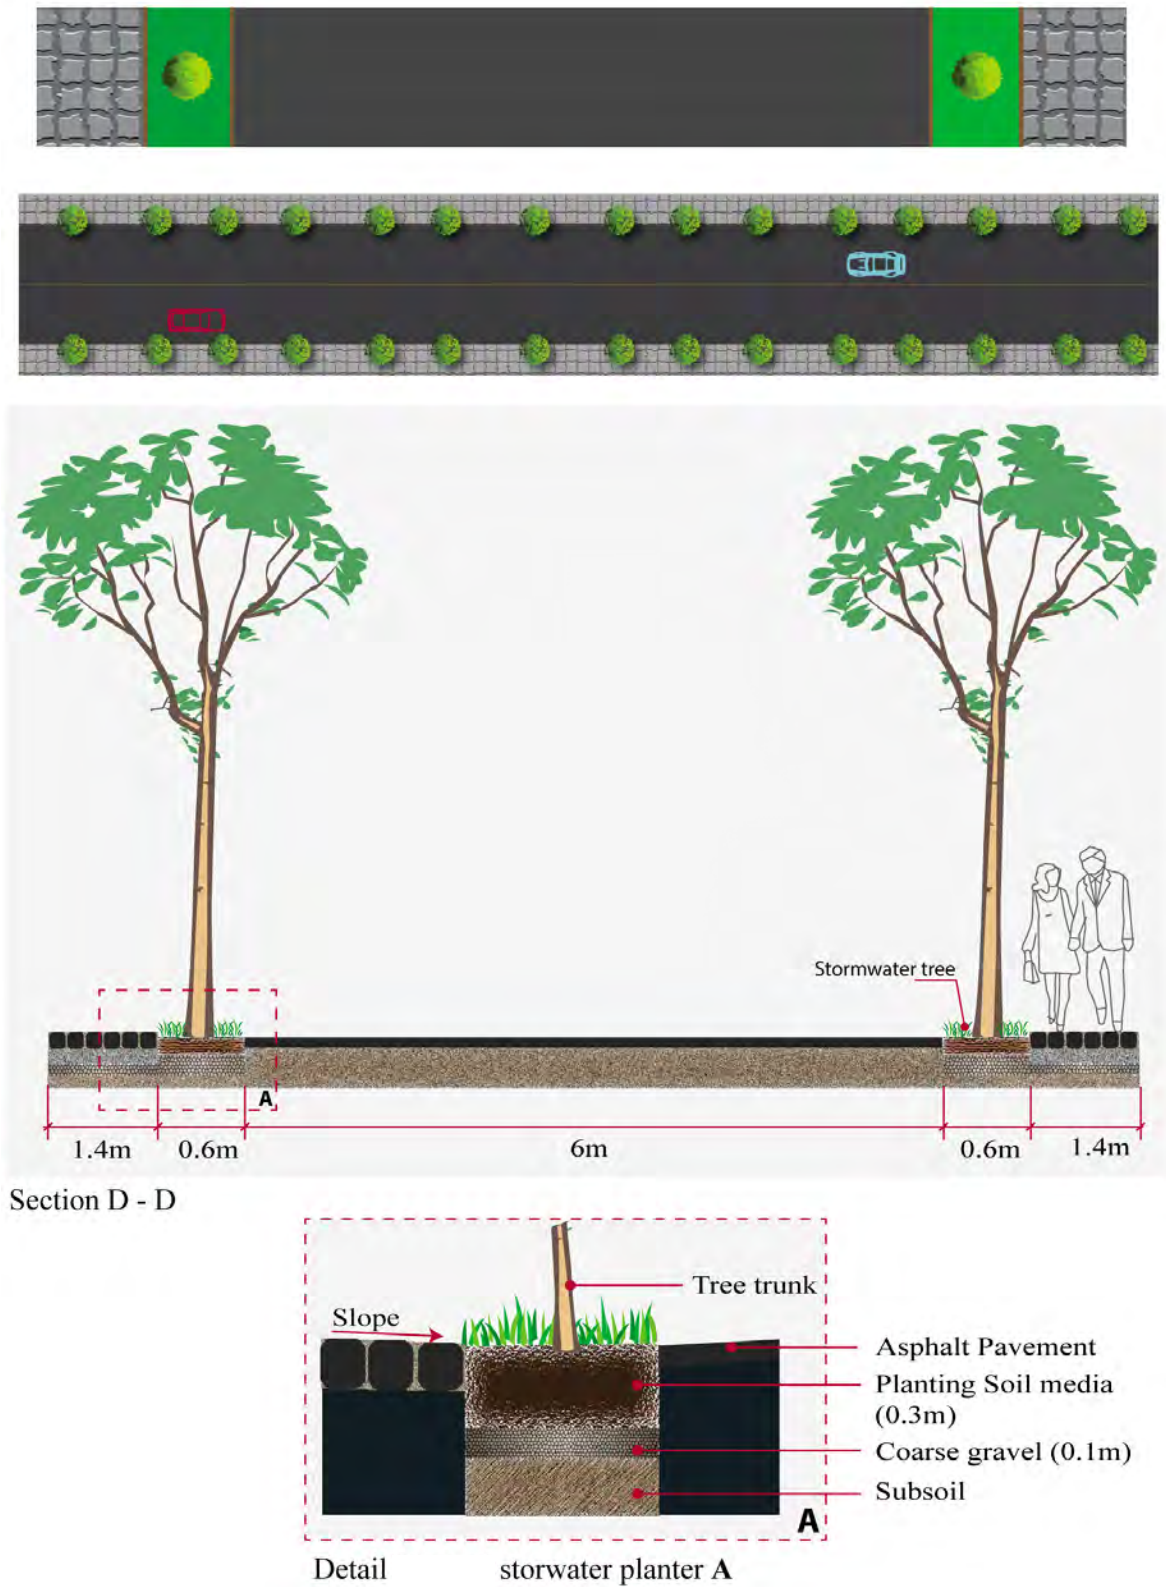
9 Street level and detail section for extended treepit/ stormwater planter
